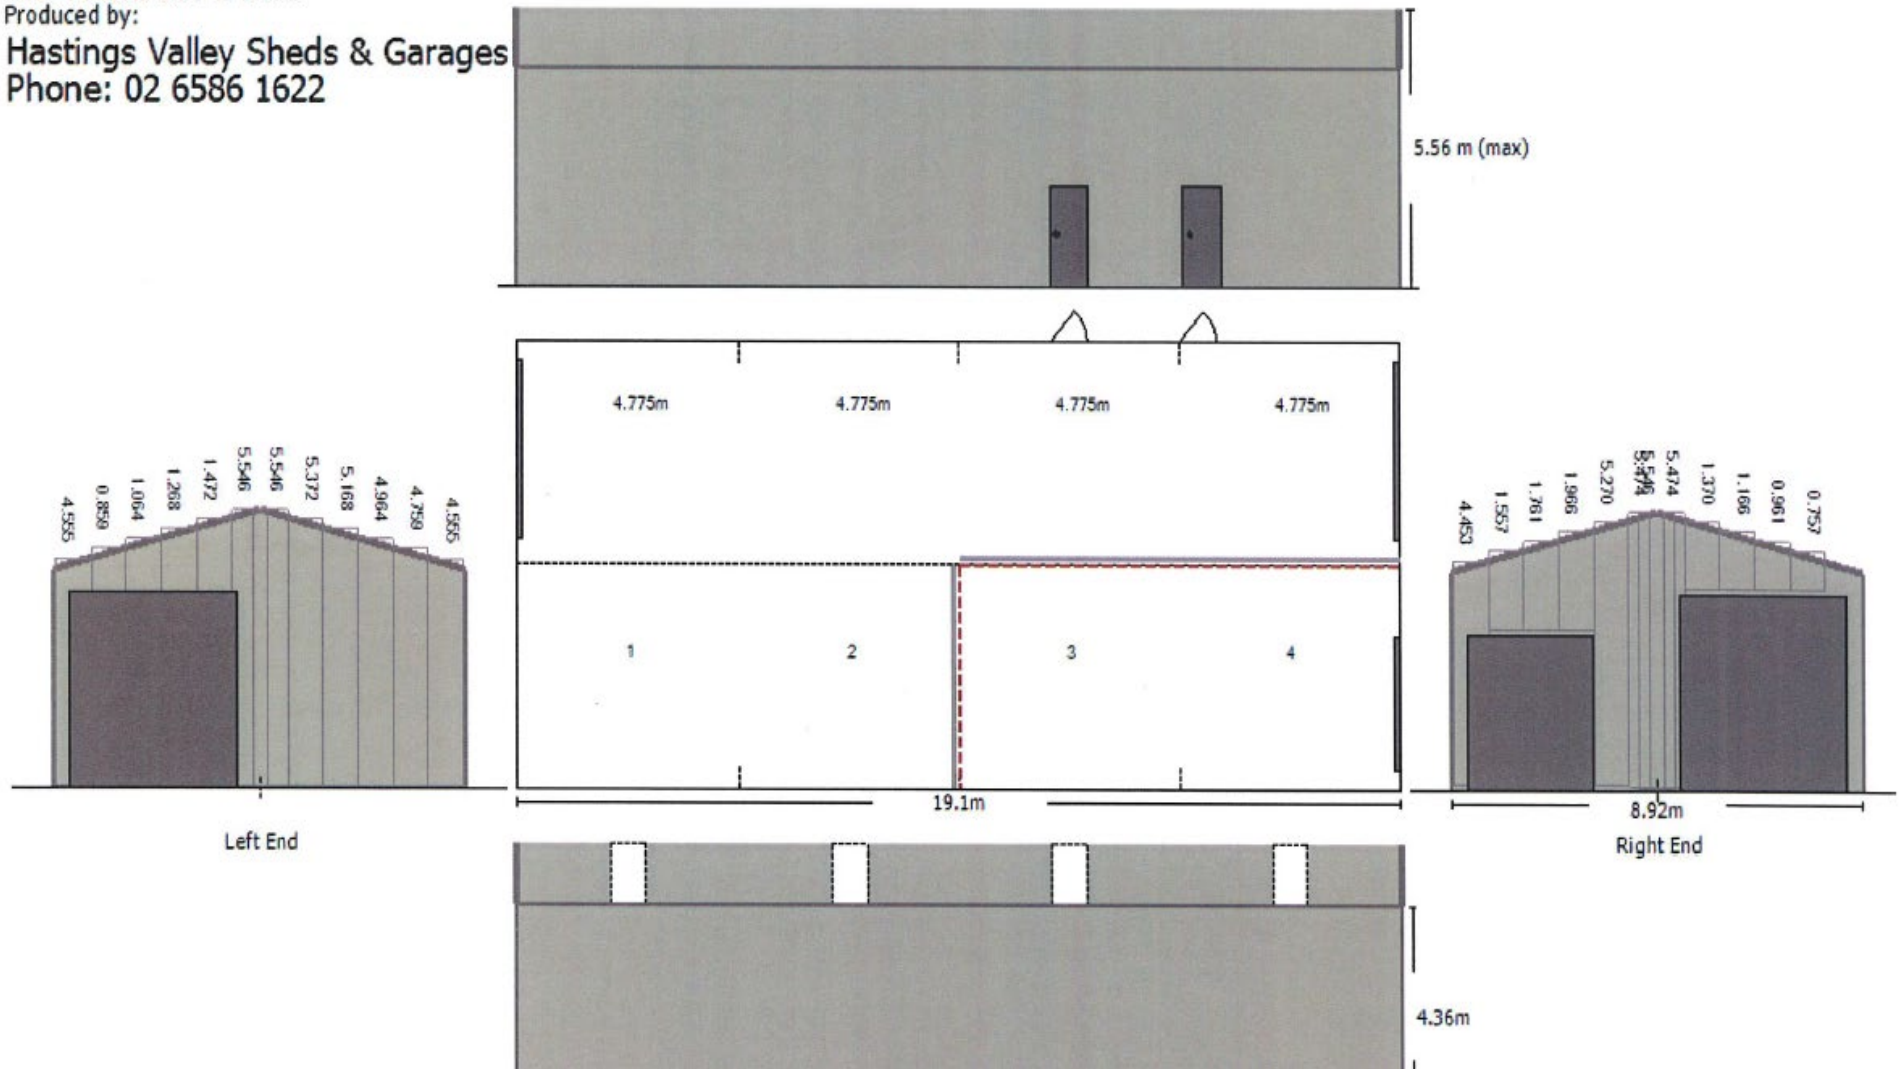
Applicant's submitted proposed Floor Plan and Elevations
